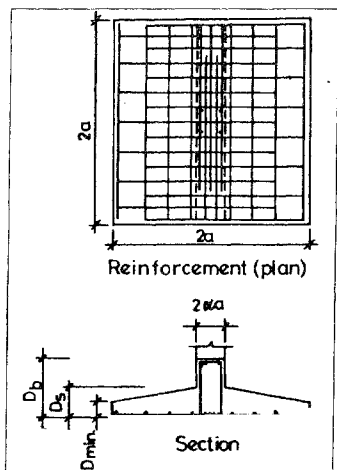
Schematic sketch of reinforcement in uniaxial beam-slab footing.
